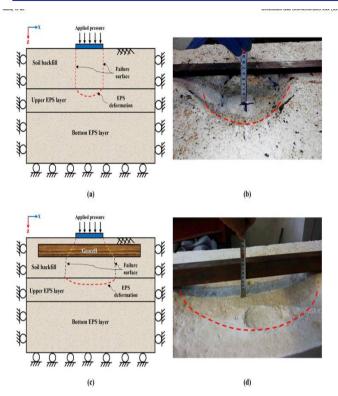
(a) Schematic view of the possible failure mechanism for unreinforced pavement foundation, (b) typical punching failure of EPS geofoam, (c) Schematic view of the possible failure mechanism of geocell reinforced pavement foundations (d) typical wider deformation basin of EPS geofoam under geocell reinforced pavement foundation.
